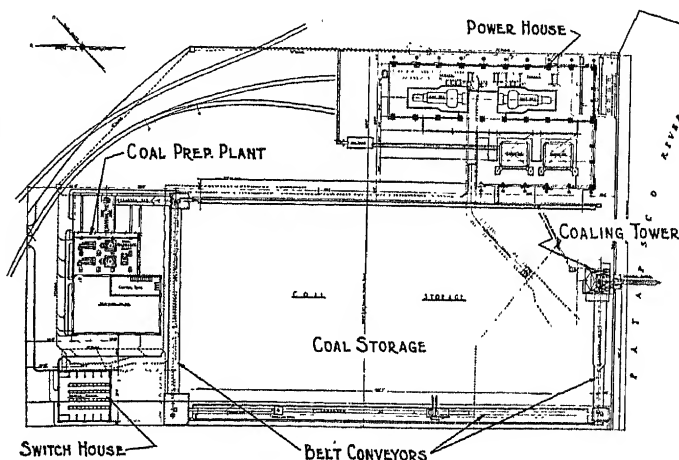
GENERAL PLAN OF STATION SHOWING POWER HOUSE, SWITCH HOUSE, COAL PREPARATION PLANT, COAL HANDLING EQUIPMENT, AND STORAGE LOT
